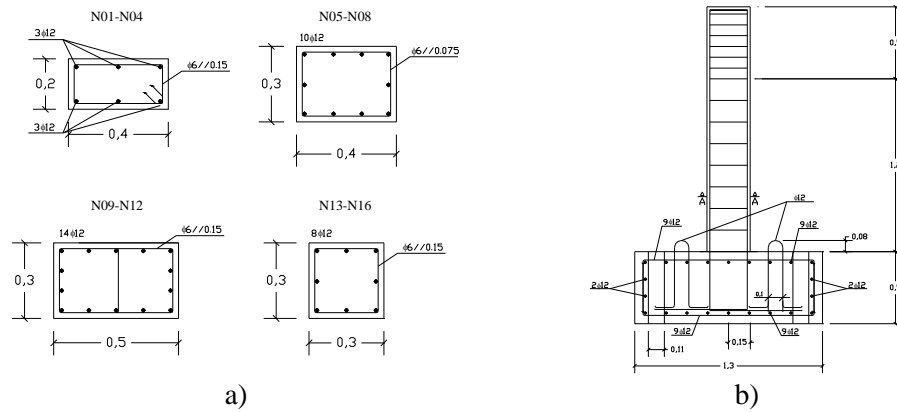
RC column specimens' dimensions and reinforcement detailing: a) Cross-sections details, b) Specimen dimensions and general scheme of the reinforcement layout
